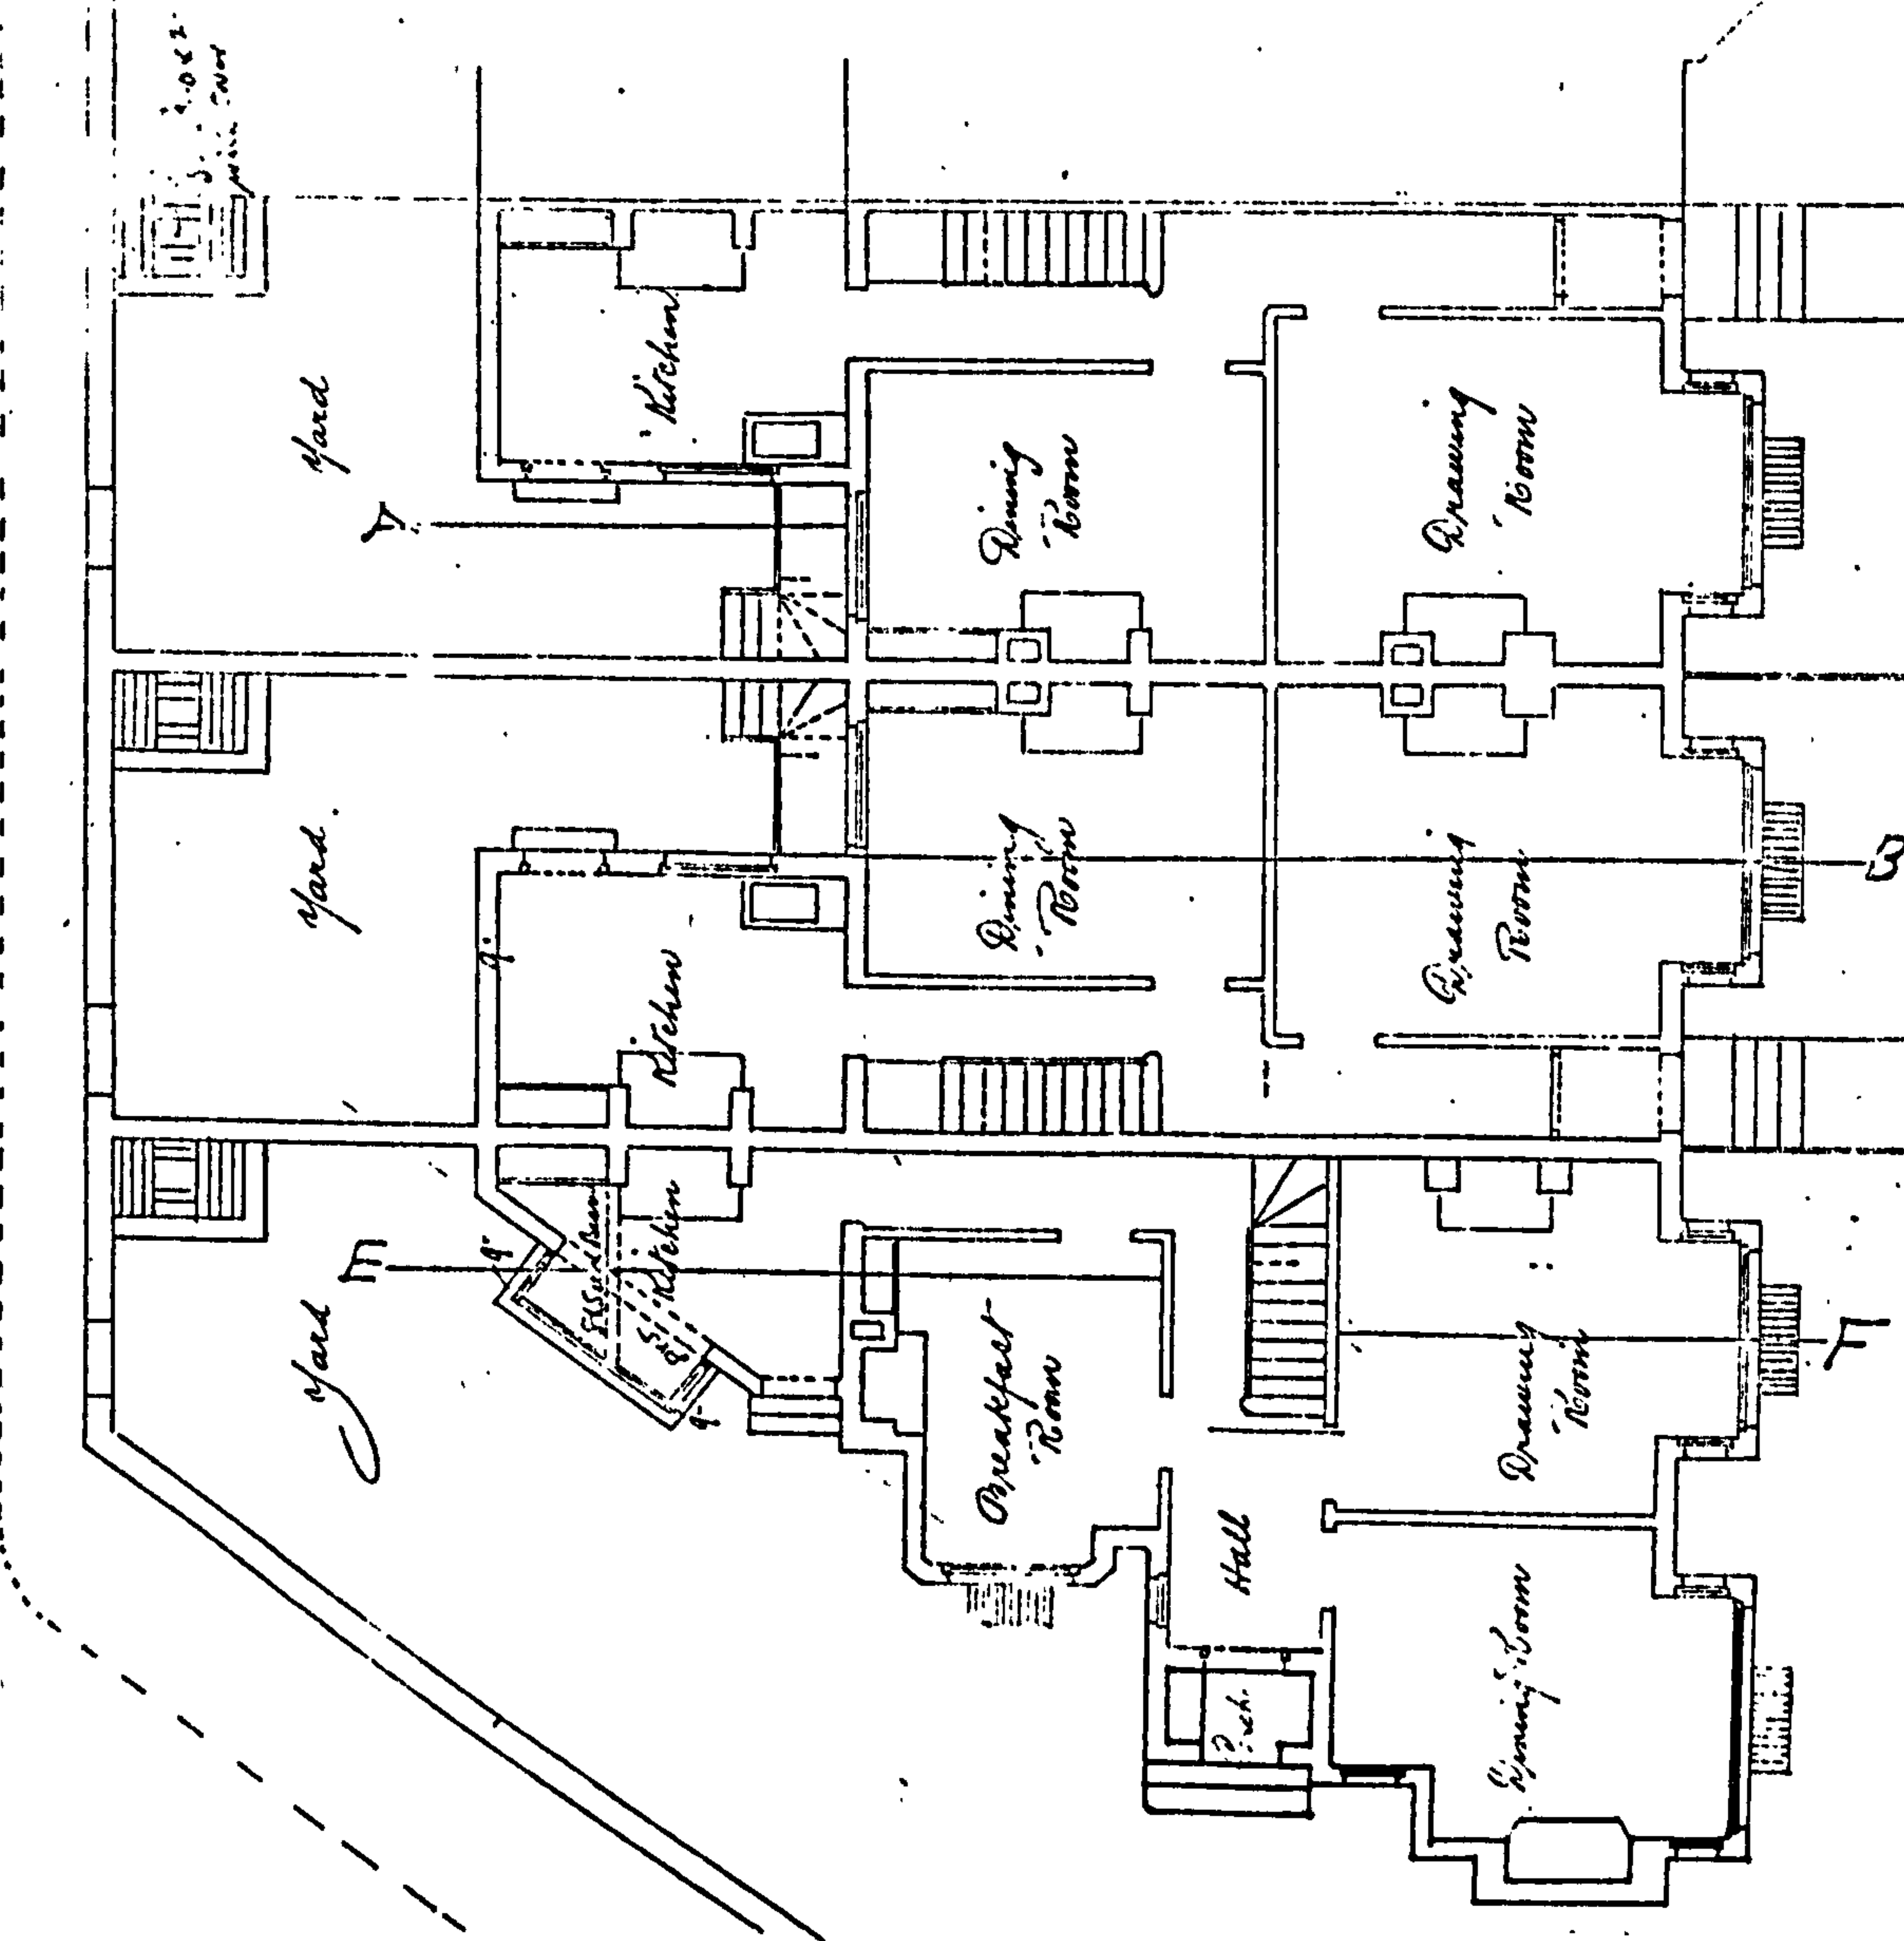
Deposited drawings for end terrace house, Brudenell Grove (A.E. Braithwaite 1896).
